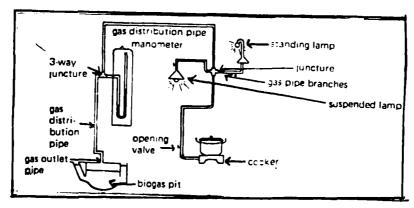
Plan of Equipment Installation for Biogas Utilization
